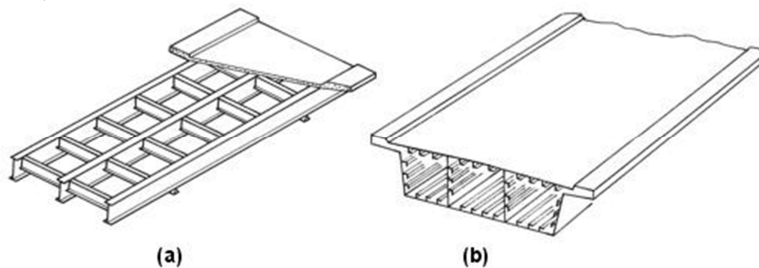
Integration development of form and structural function: A) Old bridge constructing which surface of bridge separately placed on beams and transverse beams, also, stood on main beams B) Today bridge constructing which the surface of bridge, not only diffused the forces but performed as a beam upper web with box section. [11]
